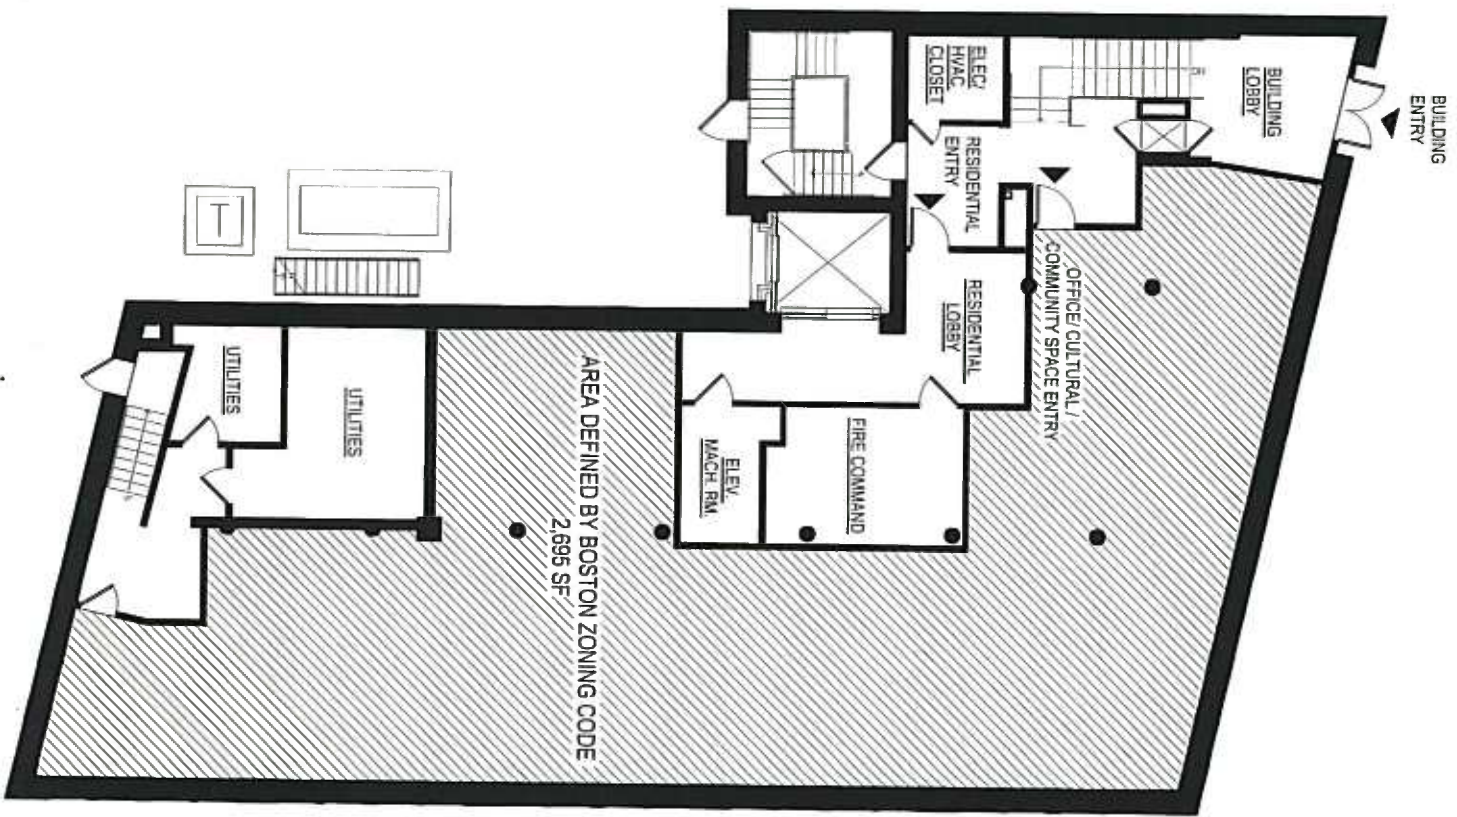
Melcher Street Ground Floor Plan
